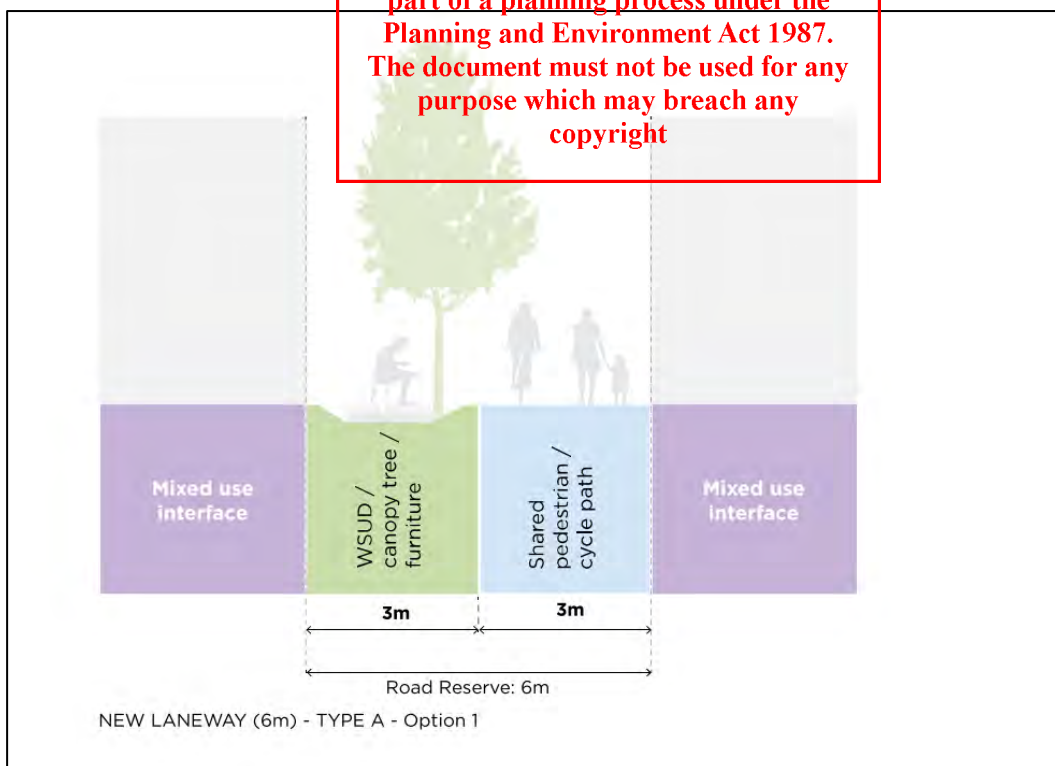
Proposed 6m Laneway Cross Section (southern extension of eastern laneway into land to the south)
